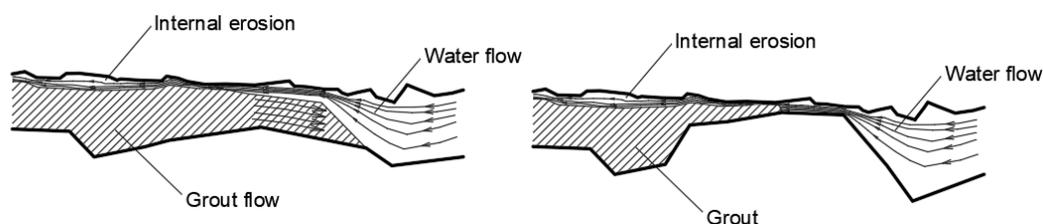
Internal erosion of grout curtain during (on the left) and after (the flow path between the non-hardened grout and the fracture boundary caused by bleeding, on the right) the grouting work
